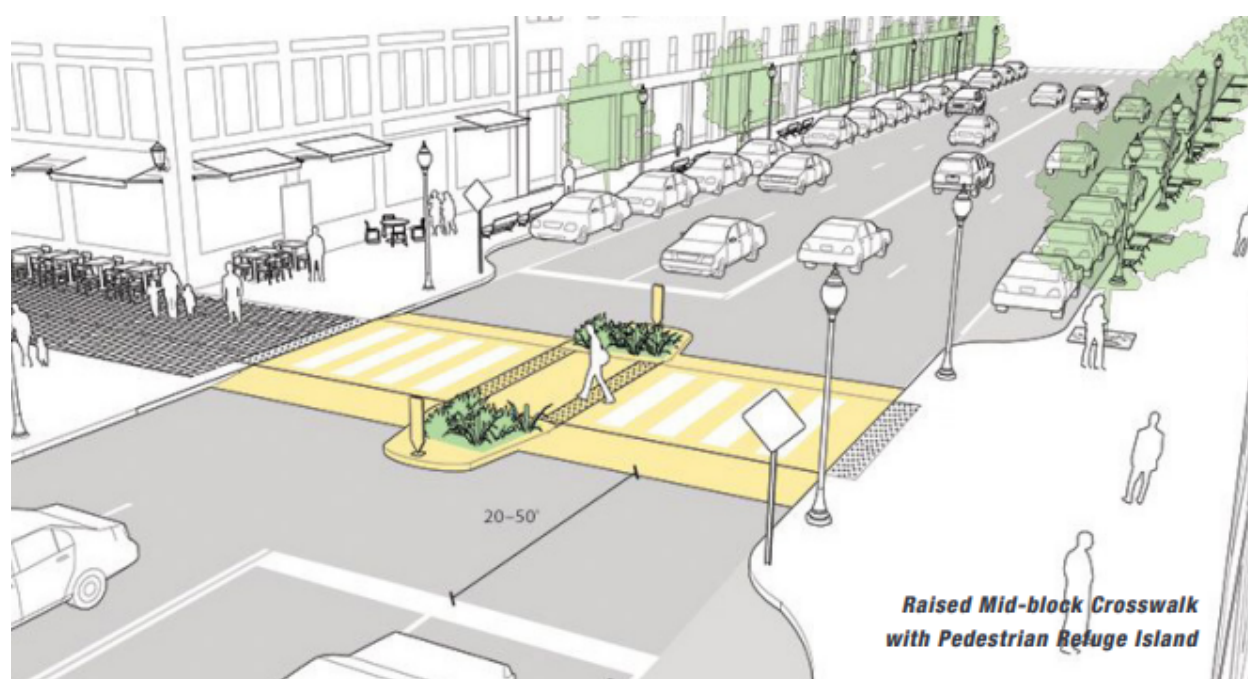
Mid-block crosswalks provide an opportunity to break blocks without adding new streets (Broward Complete Streets, 2019)
